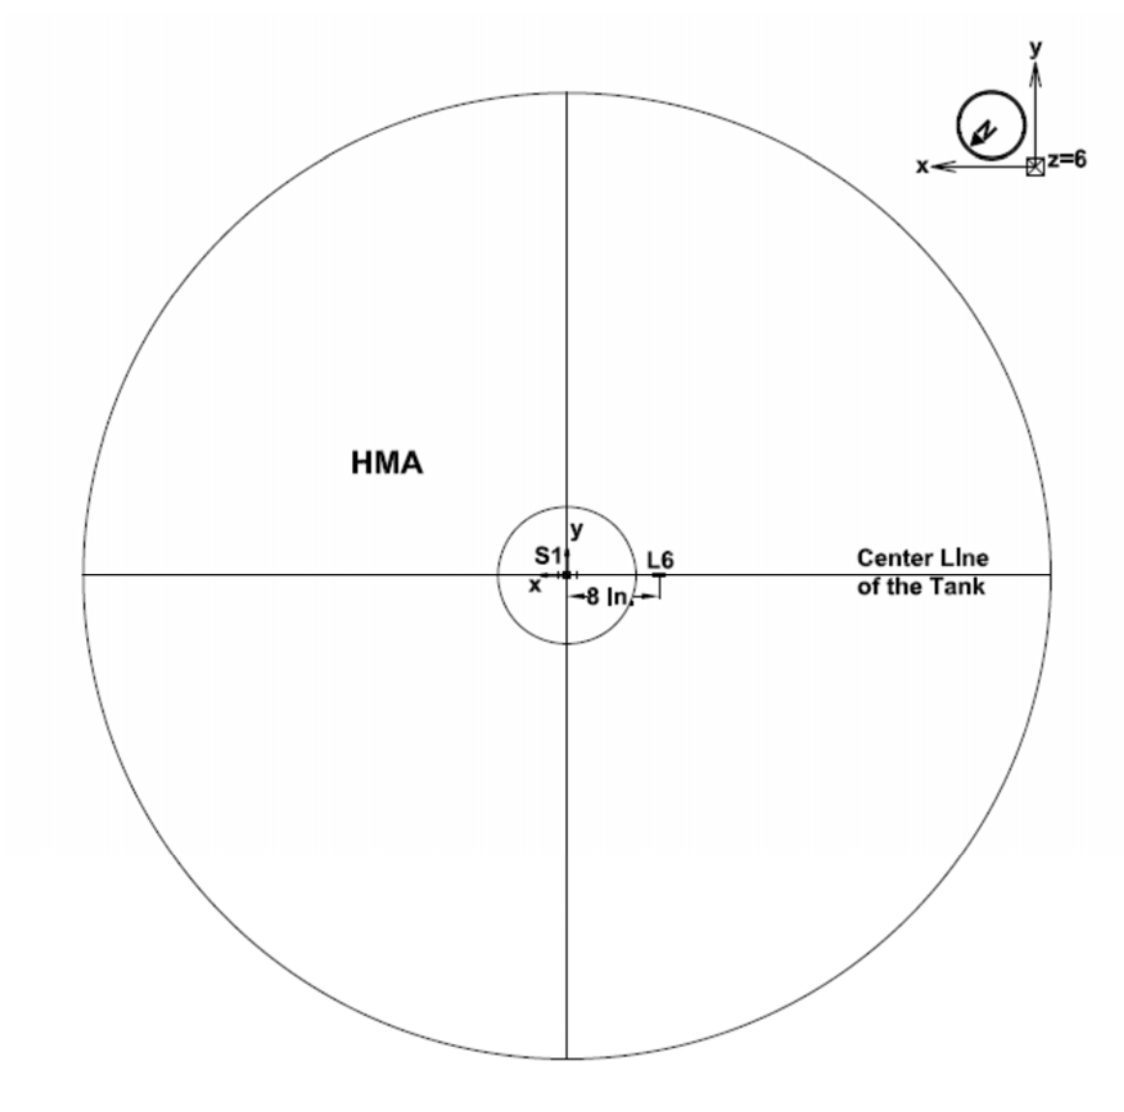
Instrumentation plan for experiment No. 5—Plan view, Z = 6 inches
